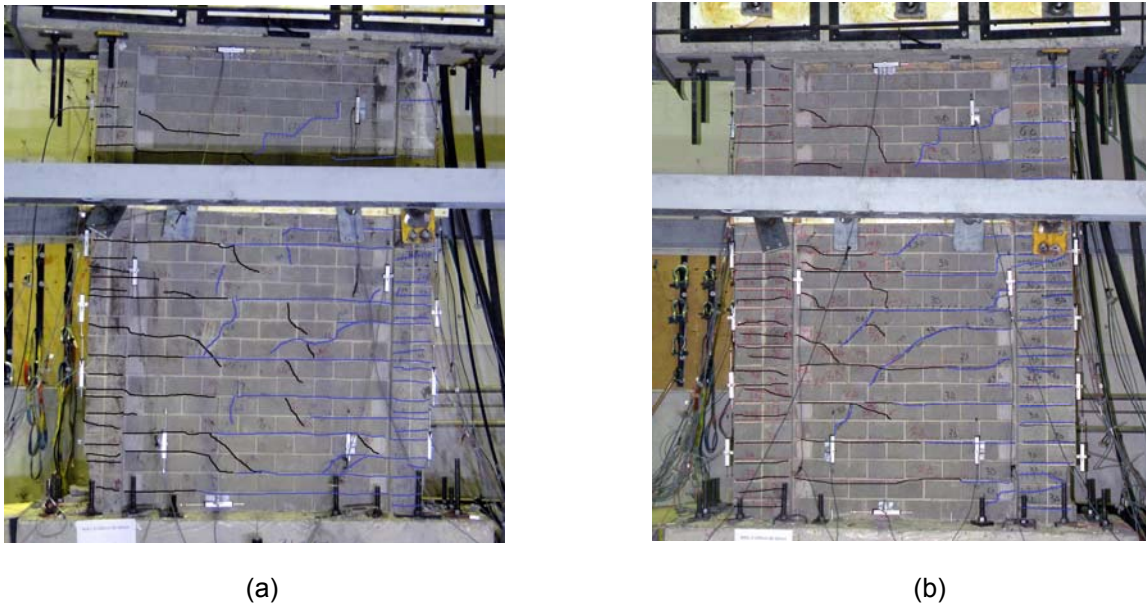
Wall cracks: (a) Wall 4, (b) Wall 5
